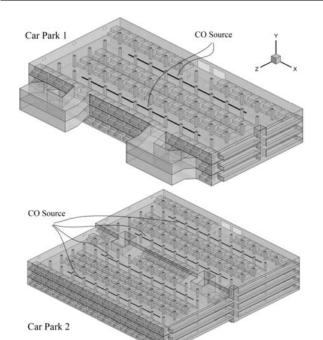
Common layouts of multilevel parking lots [6] شكل 1 هندسه متداول پاركينگهاى طبقاتى [6]
